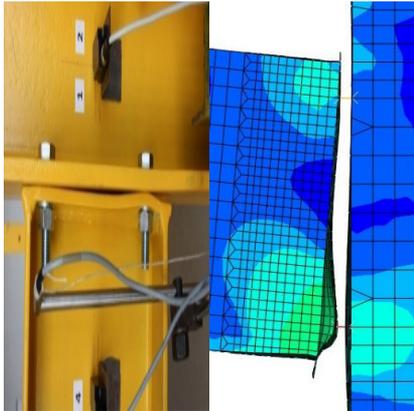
Deformed shape of steel joints with flush end-plates from test and FE-joint, sagging bending
